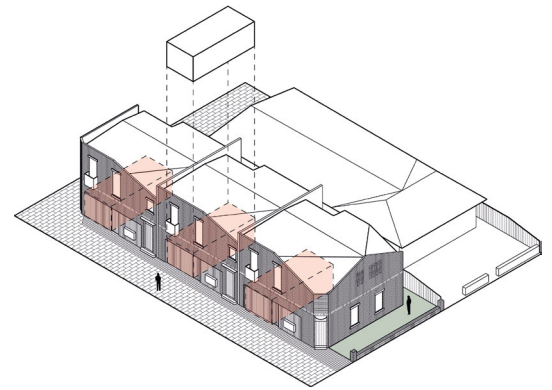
Garages provide each home with a potential extra room for flexible use.
